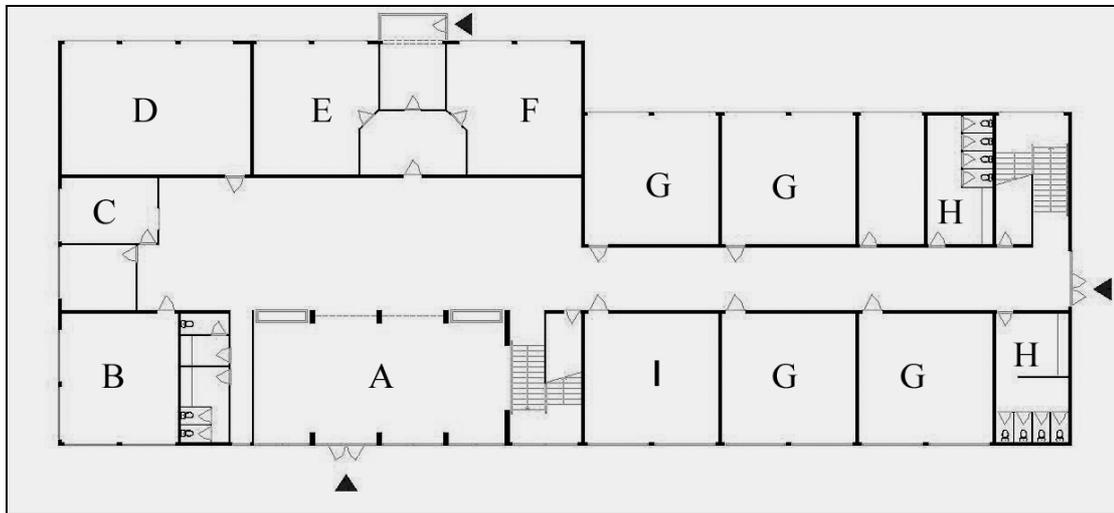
Ground floor plan of administration building (Building A) of Deniz ES. A-Entrance hall, B-Teachers' lounge, C-Administrative offices, D-Science Lab., E-Meeting room, F-Principal's office, G-Classrooms, H-WC, I-Computer Lab.
